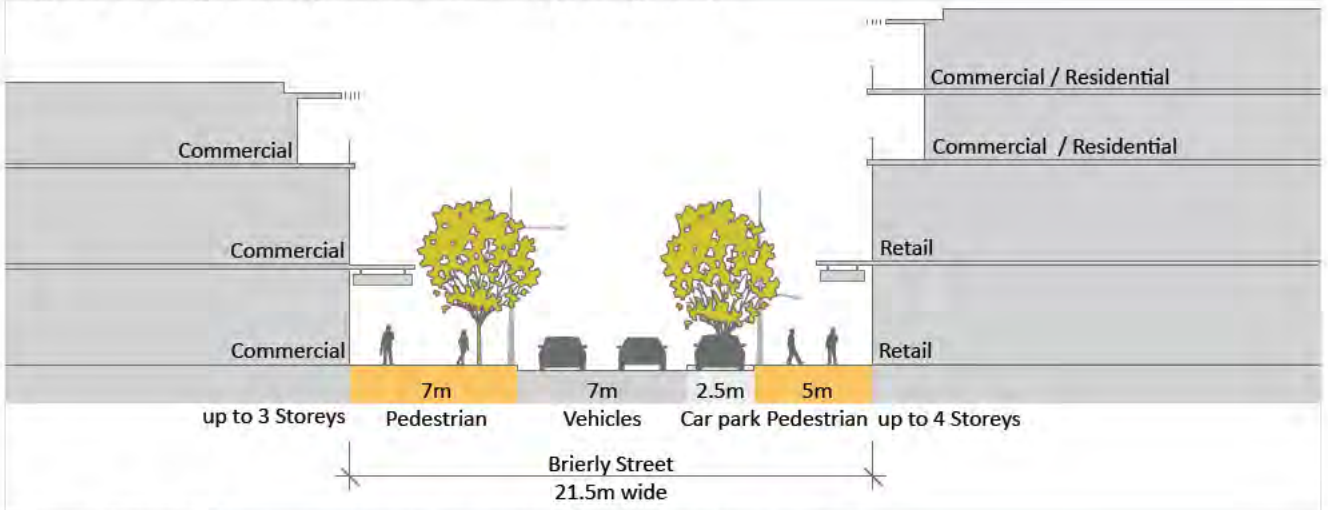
Brierly Street mixed use residential cross-section B (See Figure 37)
